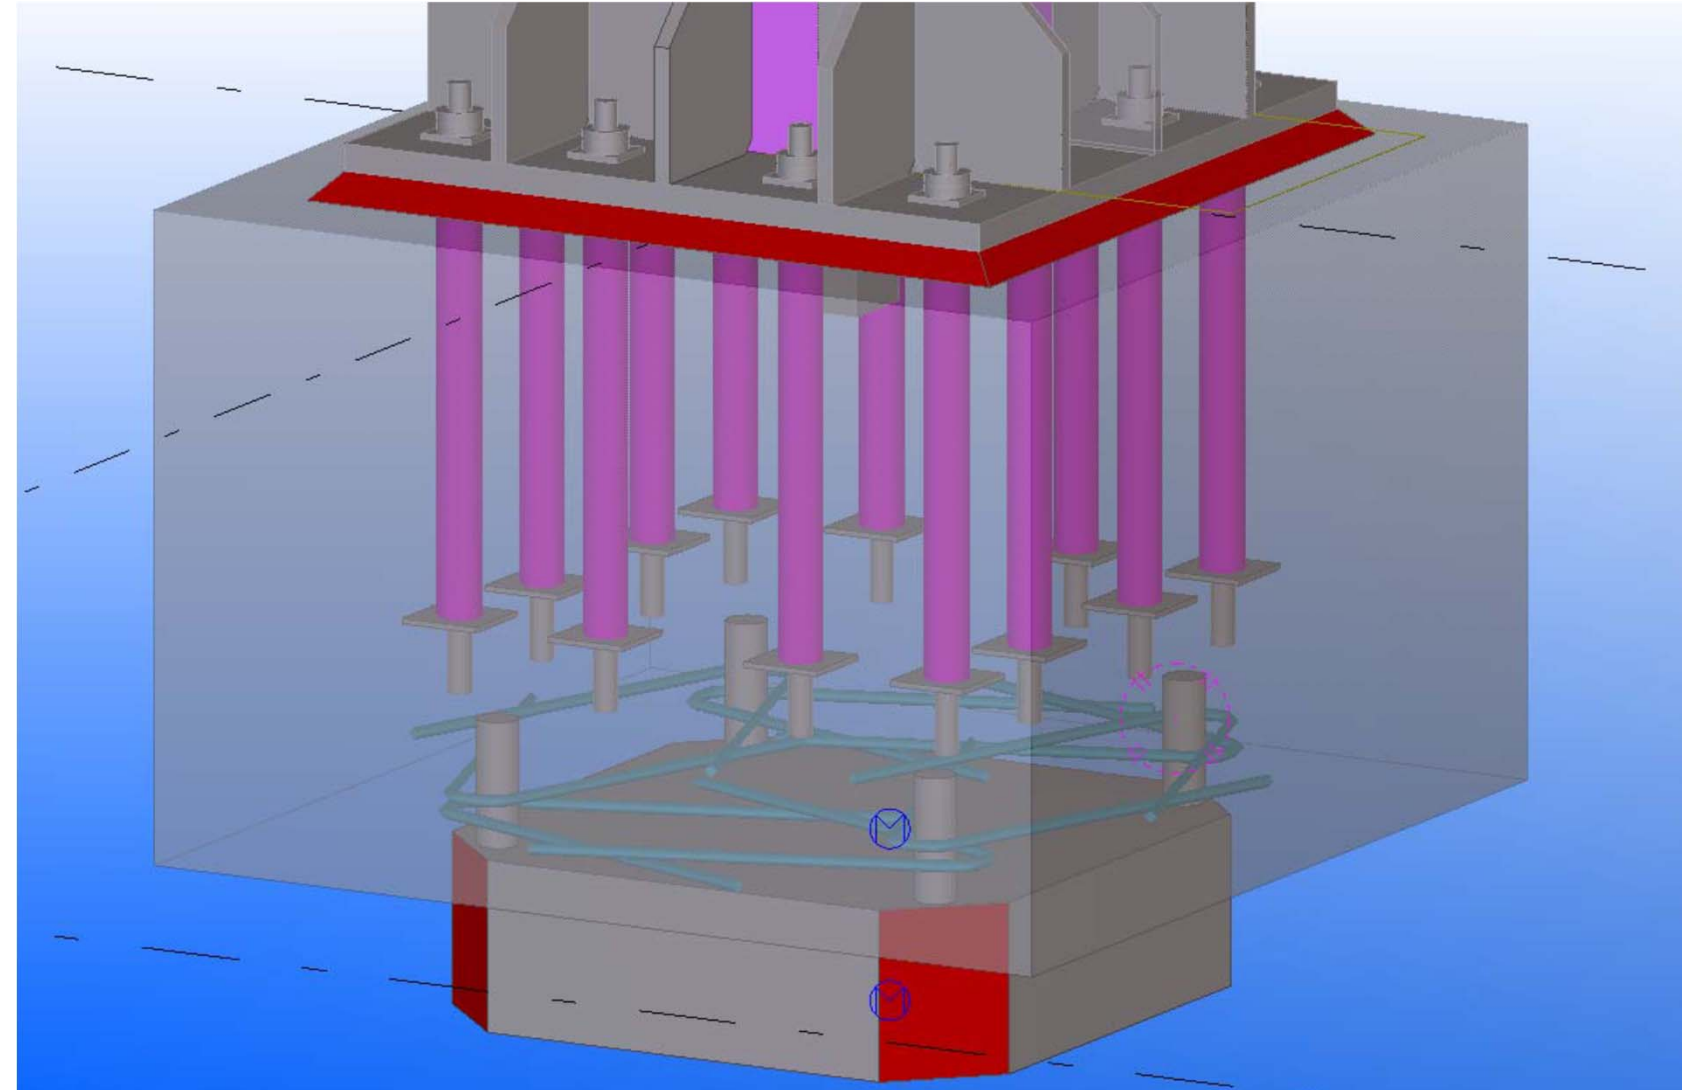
Edge reinforcement and anchor reinforcement for shear.
